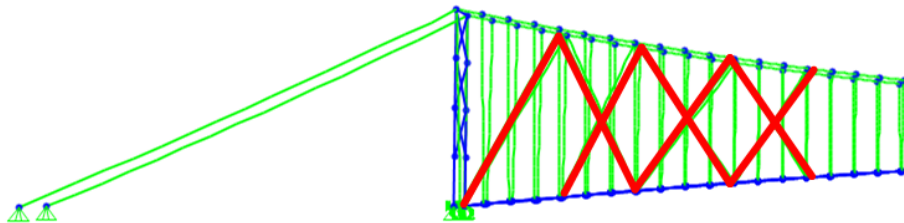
Vertical Bracing Pattern at Ends of 70 m Span Footbridge
